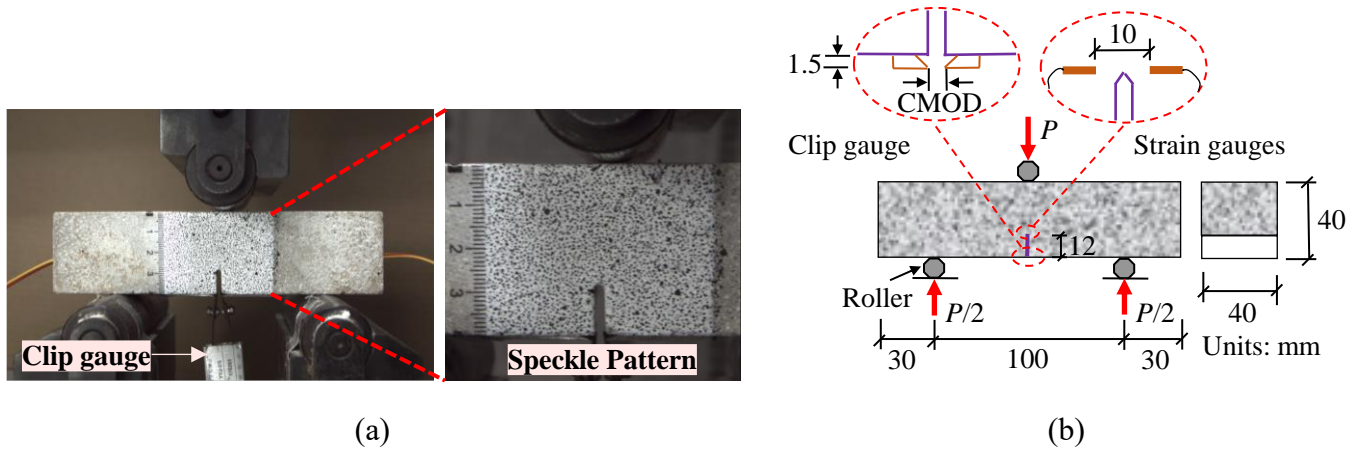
Schematic illustration of three-point bending test: (a) Front view; (b) rear view.
